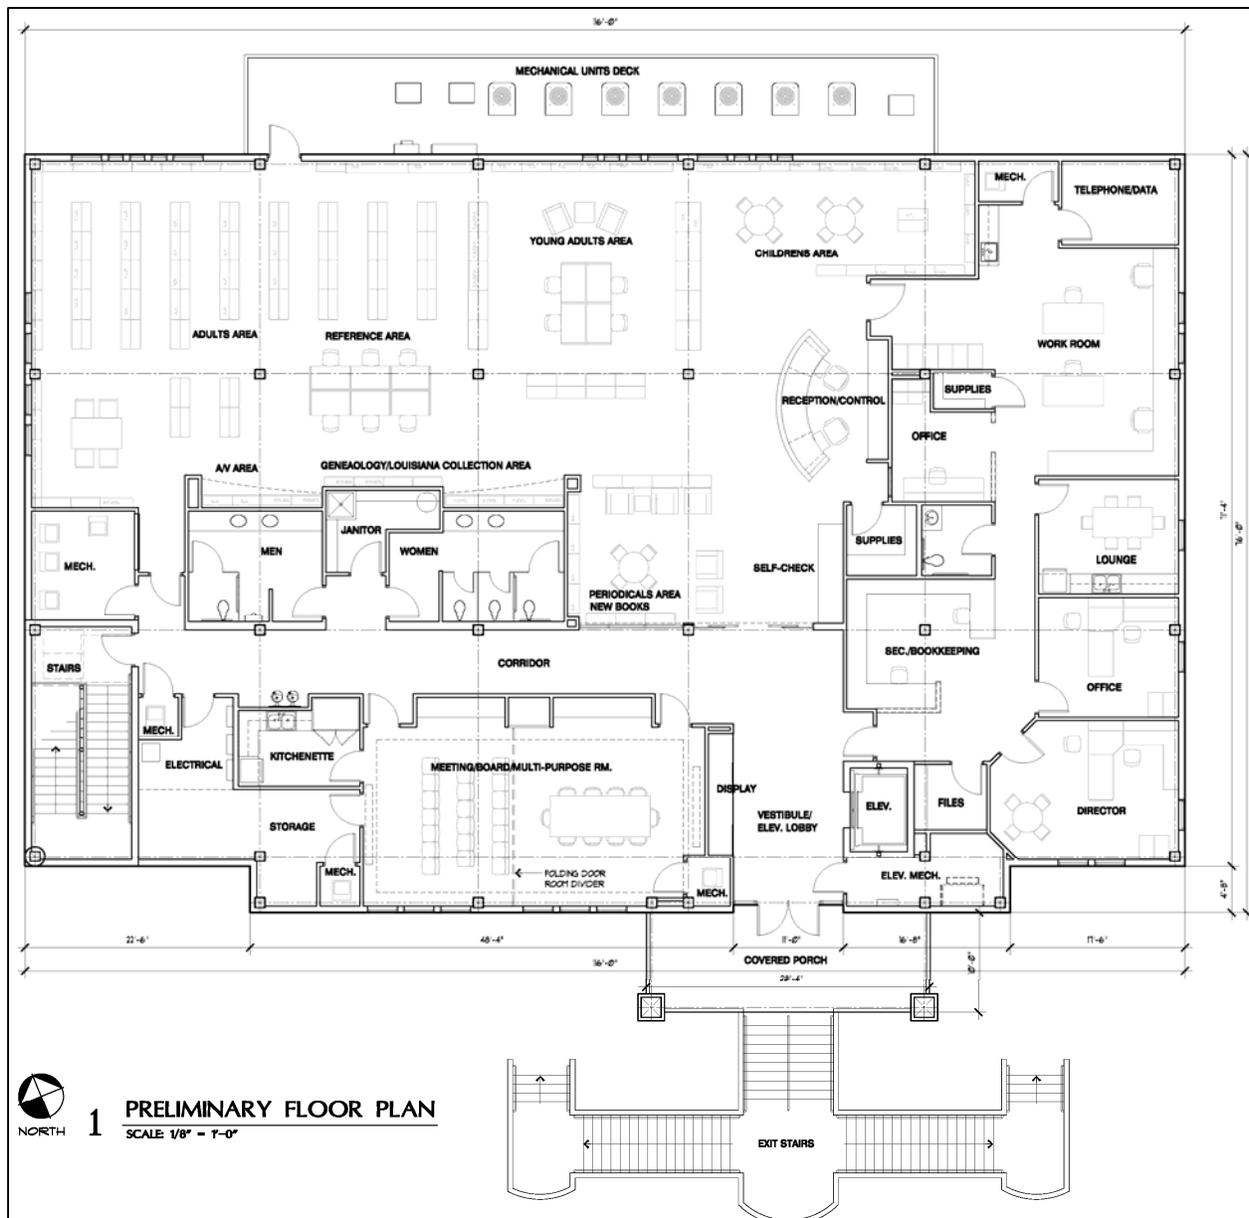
Preliminary Floor Plan (Police Jury Parish of Cameron, 2010)
